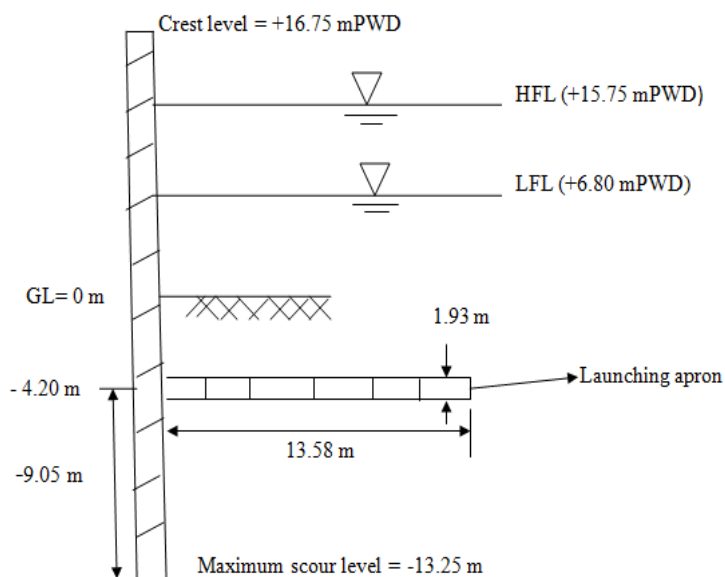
Cross section of Sirajgonj hardpoint at straight portion
